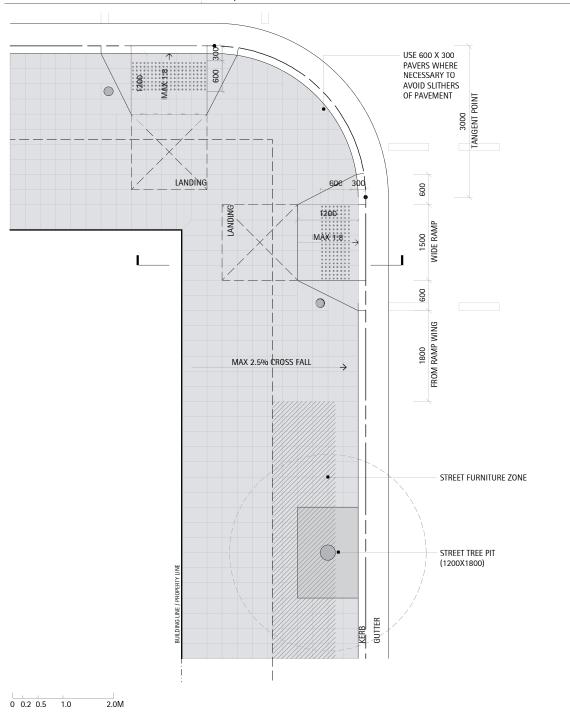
Streets Corner Plan: 3000 Radius 1500 Ramp
